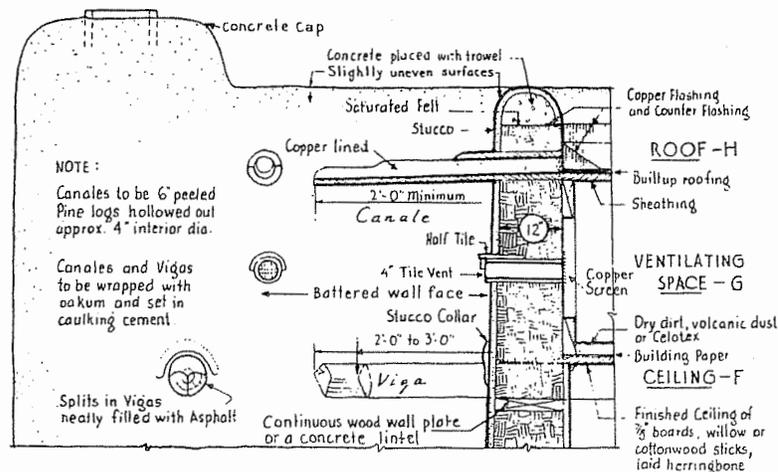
Parapet wall showing canales, vigas, and air chamber.
